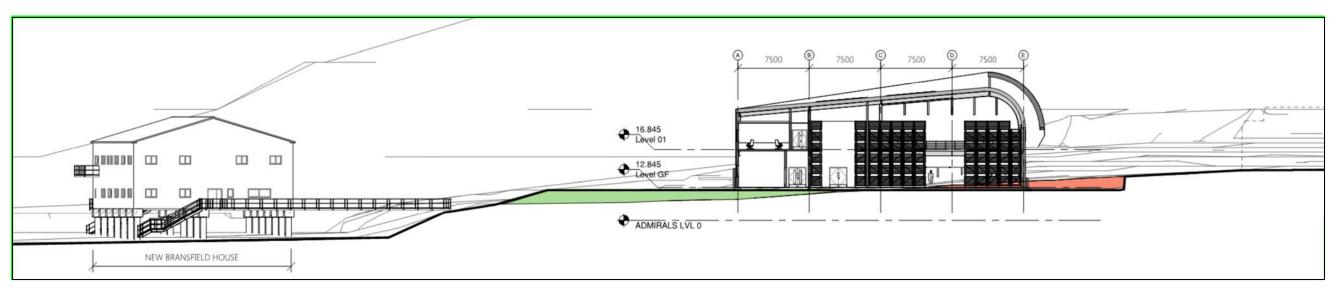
Cross section showing the proximity of the new Operations Building in relation to New Bransfield House.
